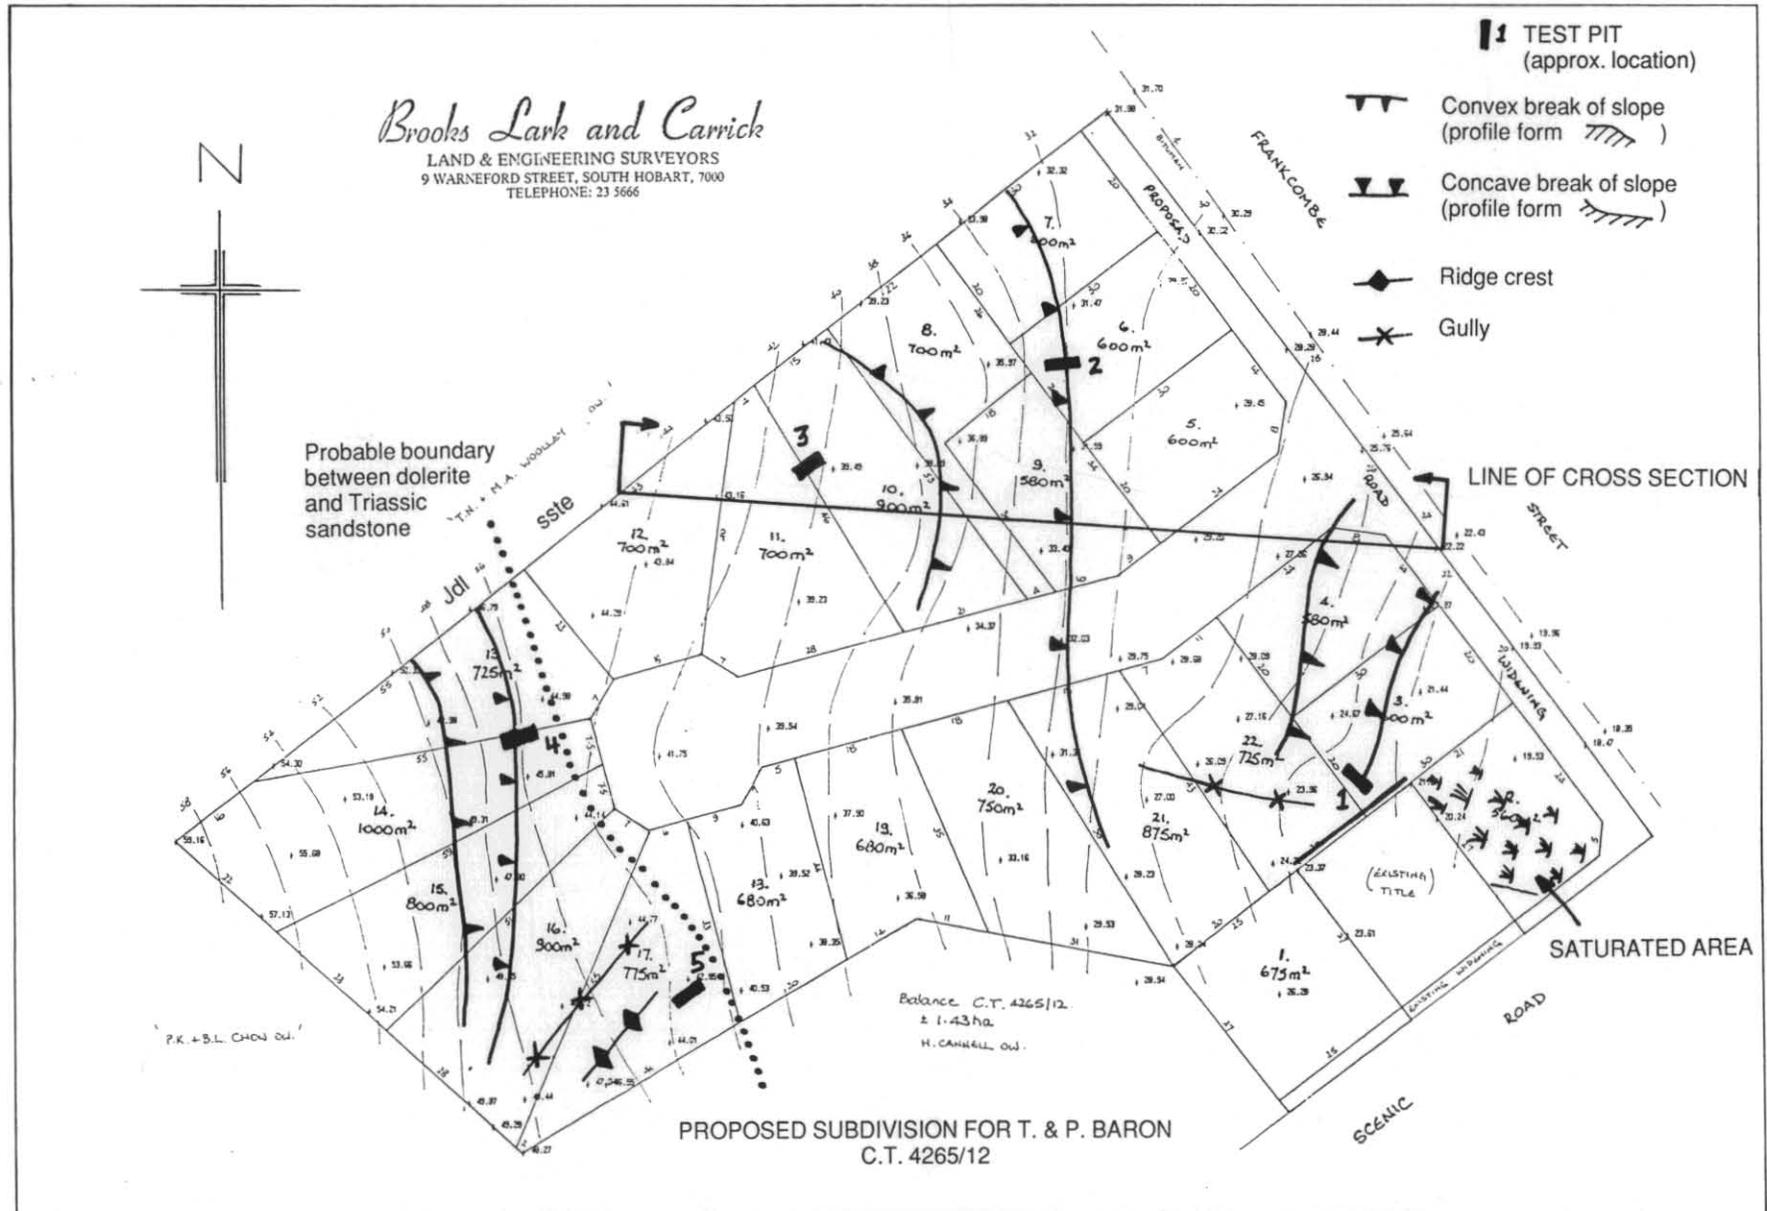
Site plan showing slope morphology, approximate test pit locations, and line of cross section used for stability analyses.
